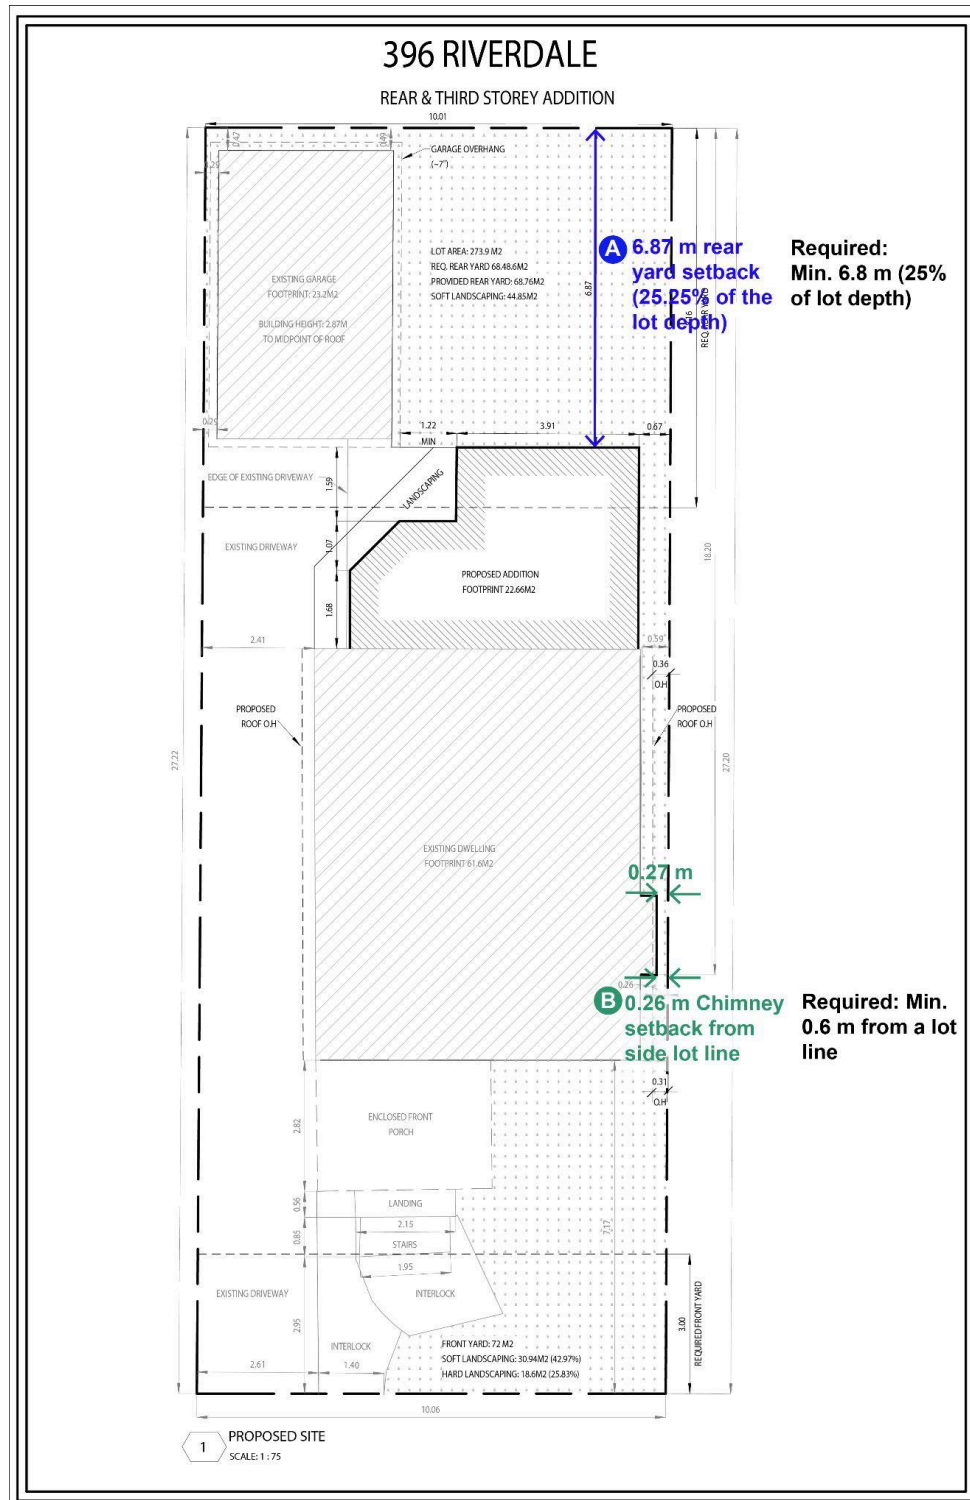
Site plan prepared by Evolution Design & Drafting dated February 23rd, 2026, showing the requested Minor Variances for the proposed development of one storey rear extension and a third storey addition.
